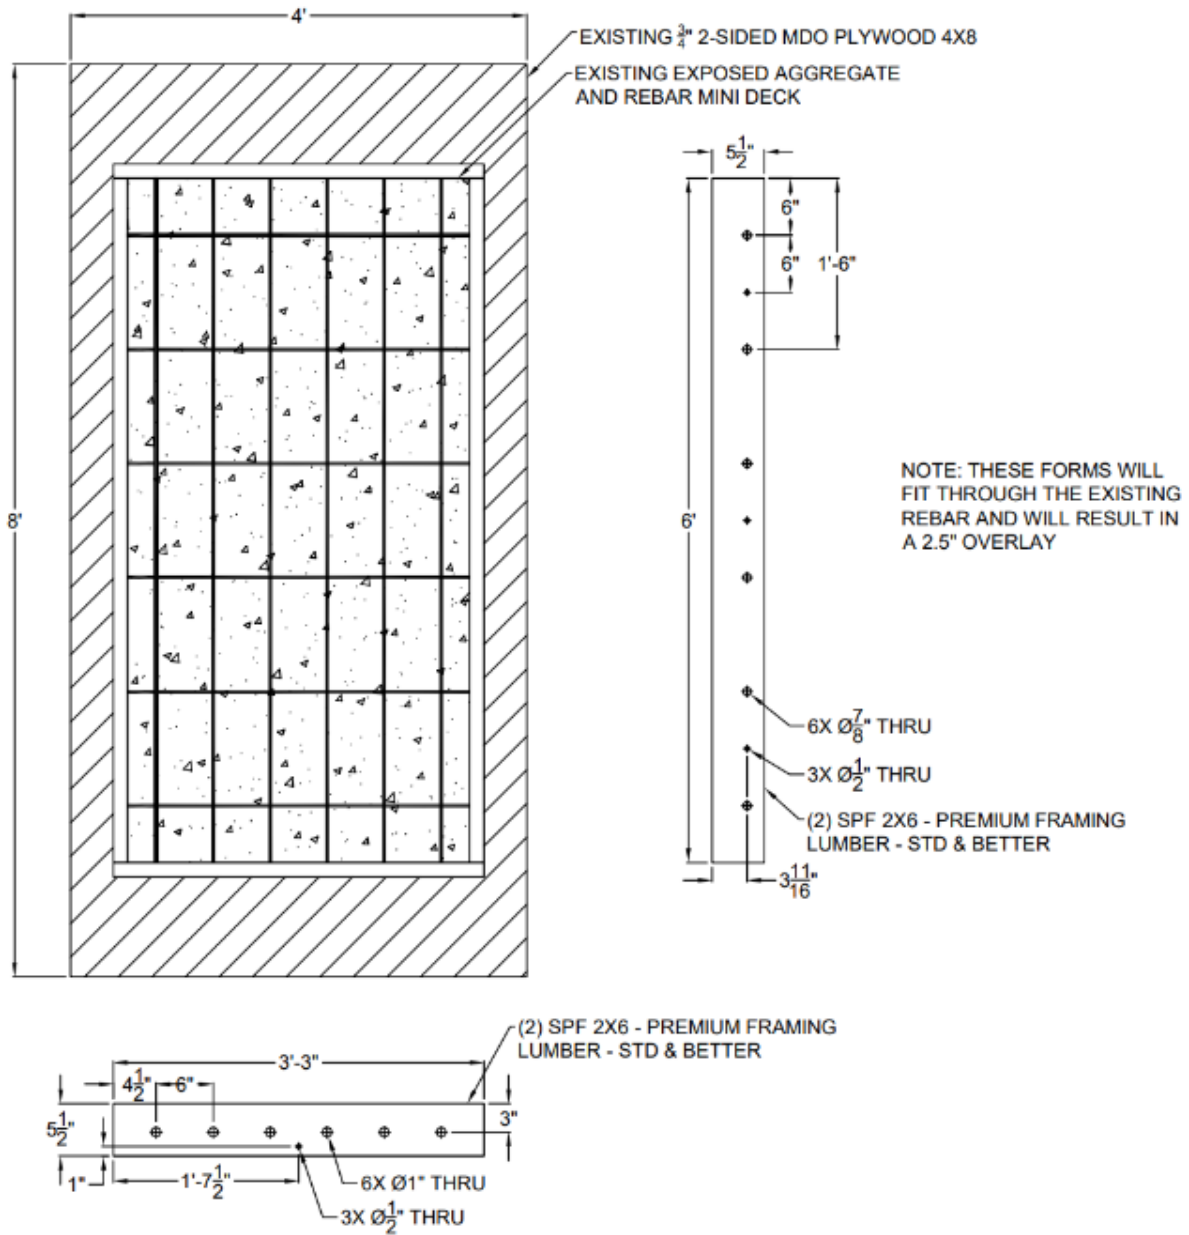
Overlay formwork drawings and dimensions for the deck with exposed rebar
